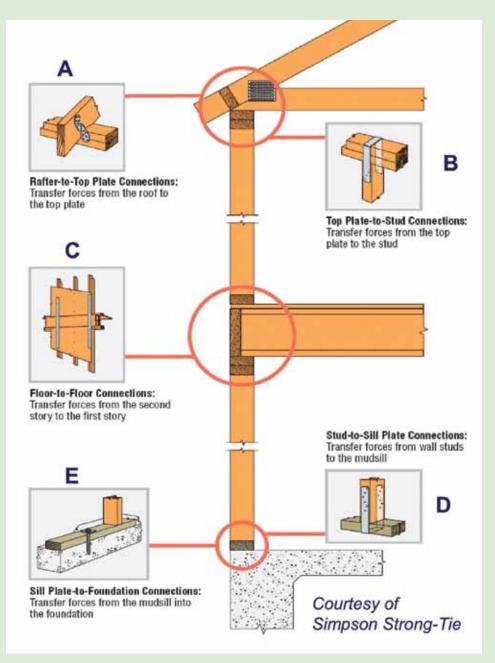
Continuous load path connection ties: (i) the roof to the wall, typically with hurricane clips (A) and plate ties (B); (ii) the wall of a higher story to the wall of a lower story with straps (C); and (iii) the wall to the foundation with plate ties (D) and anchors (E). For a single story house, the connections at C are not needed. These connections are in all new houses (see Table 4-1). Older homes usually will not have these features. In many cases, retrofit can easily be done for certain portions.
